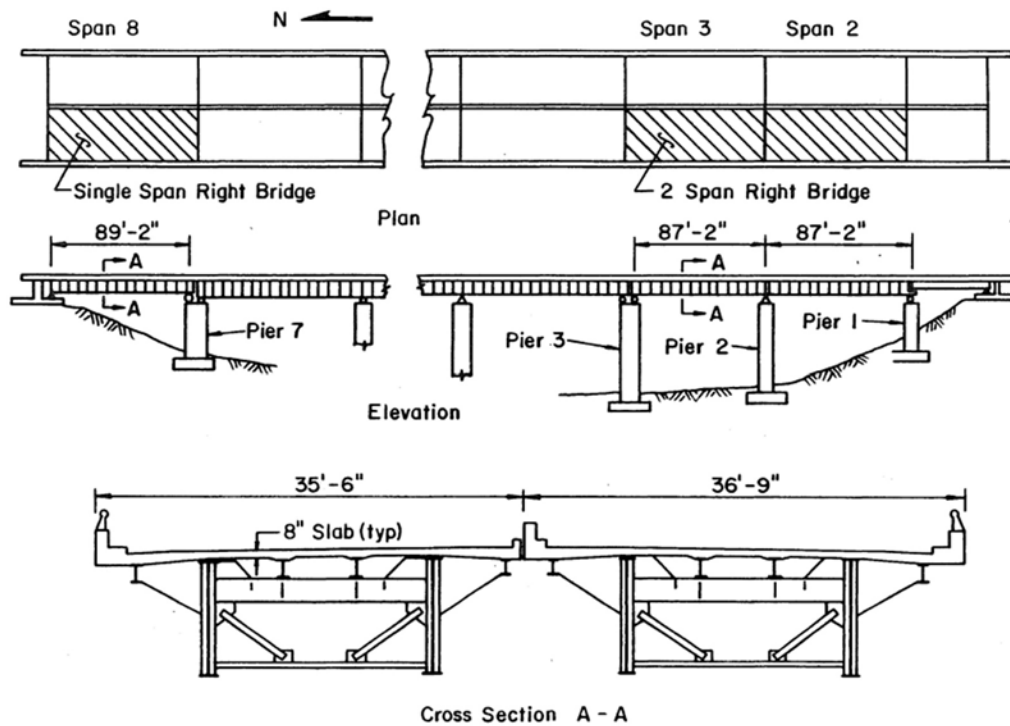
Overall Plan and Elevation of the Betzwood Bridge (Daniels et al., 1987)
